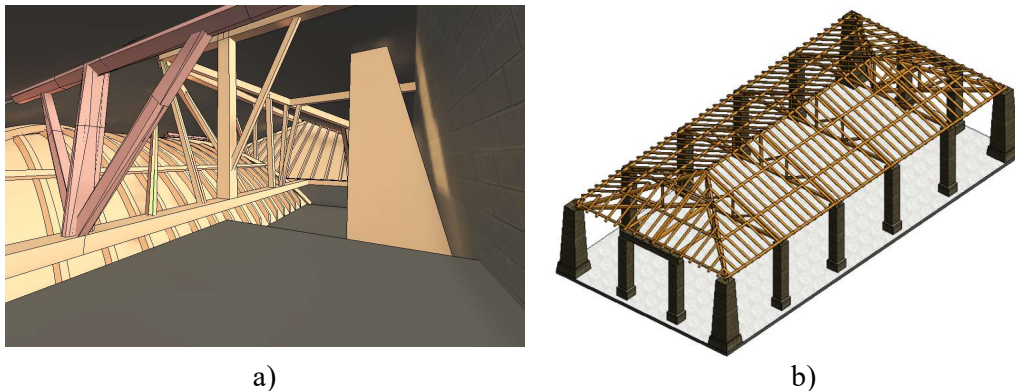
3D modelling of historical timber roofs: a) Former Town Hall (Guimarães, Portugal); b) “El Lavadero del Arenteiro” (Ourense, Spain)
